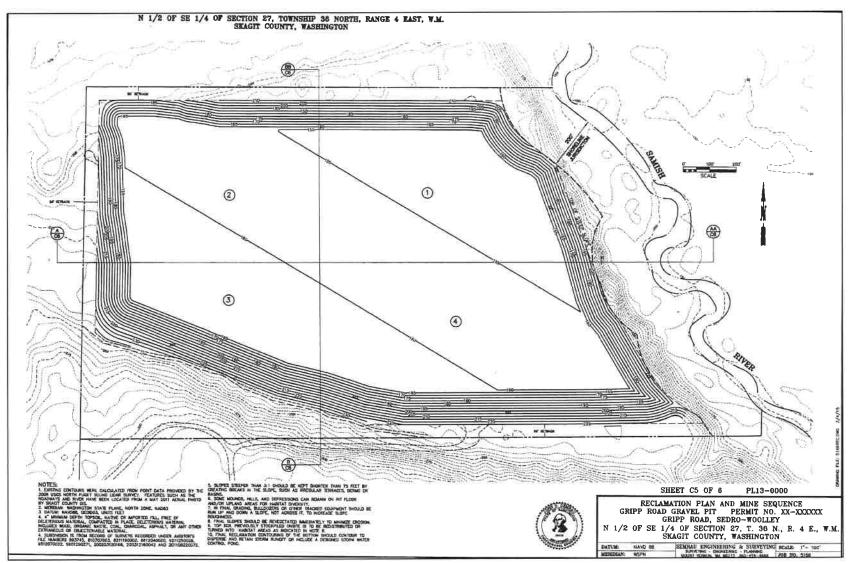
Proposed mining plan provided by Miles Sand and Gravel,
